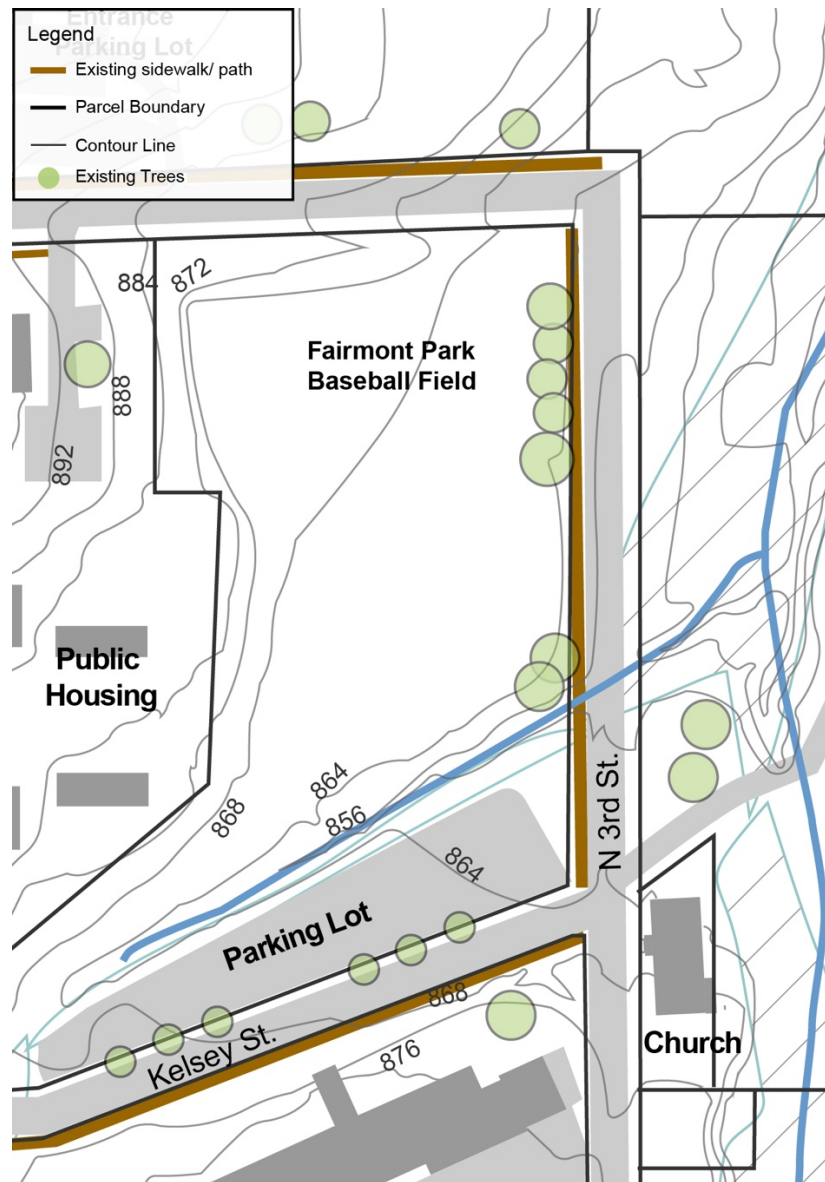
Street Segment 2 – Existing conditions (By author)
